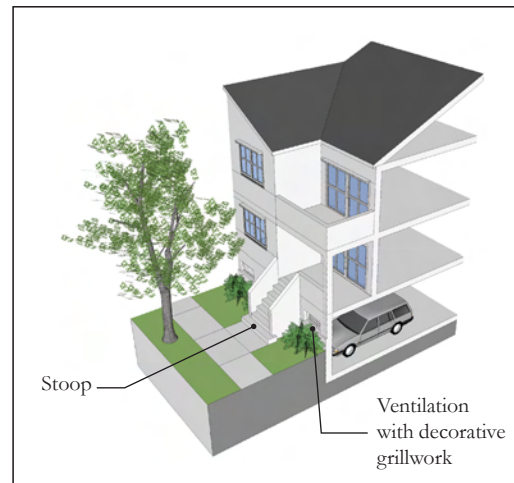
Semi-depressed parking should be screened with architectural elements that enhance the streetscape such as stoops, porches, or balcony overhangs.
